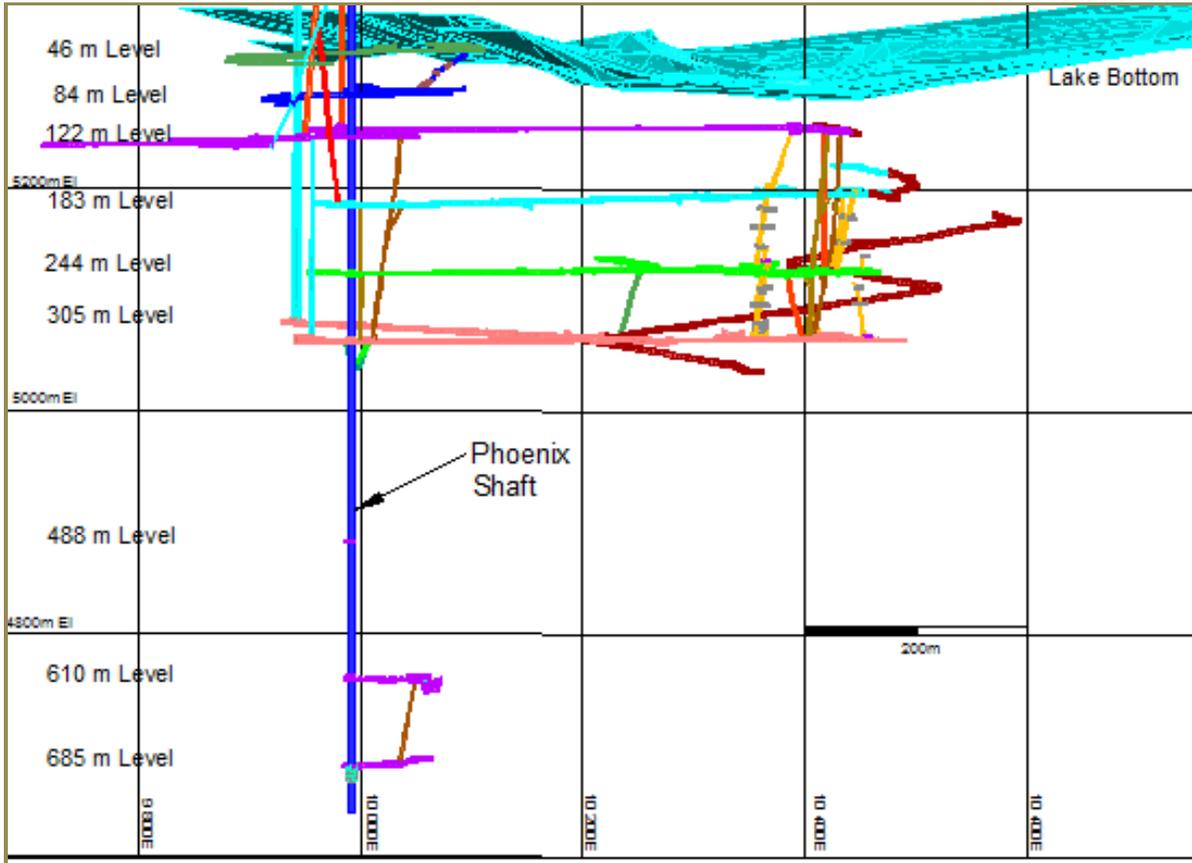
Phoenix Gold Project—Underground Workings (Looking Grid North) (Rubicon, 2019)
